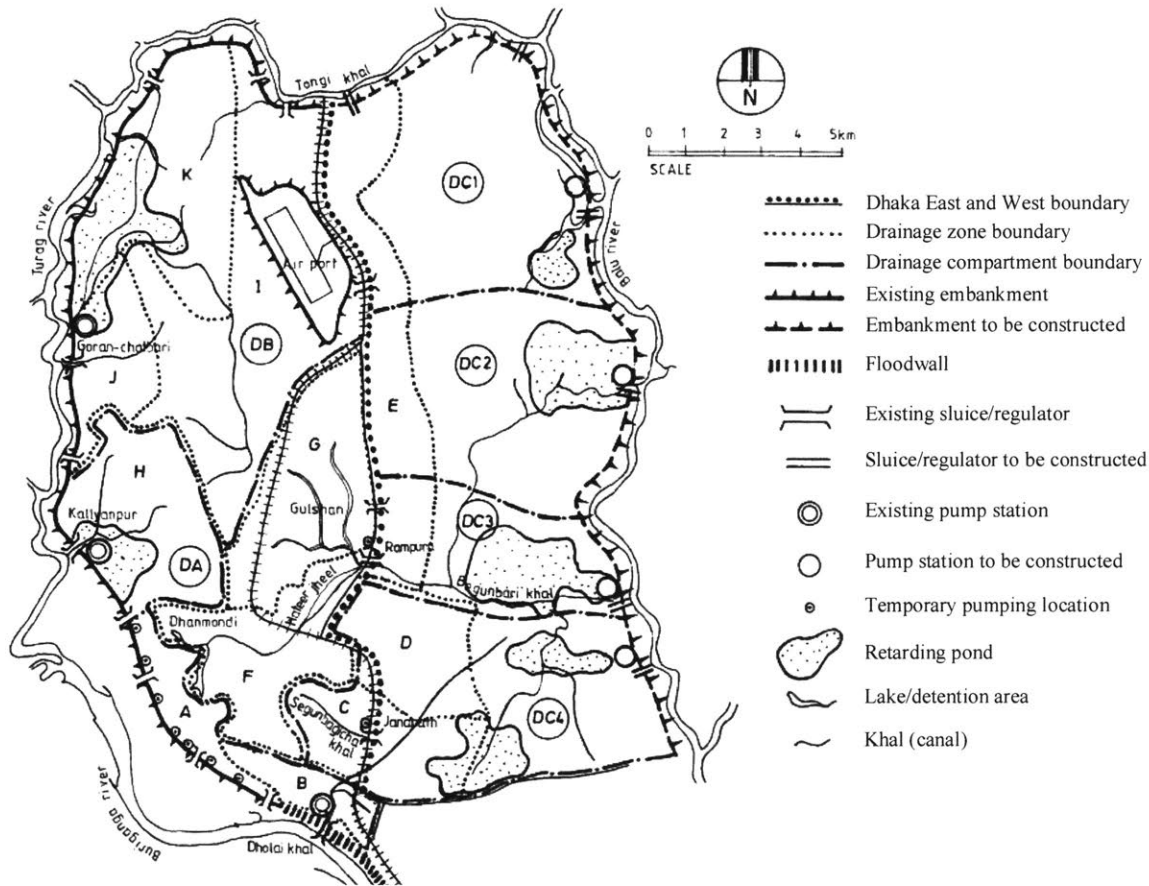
Dhaka's built (western) and planned (eastern) embankments as shown on a plan from the FAP 8b plan (1991).
